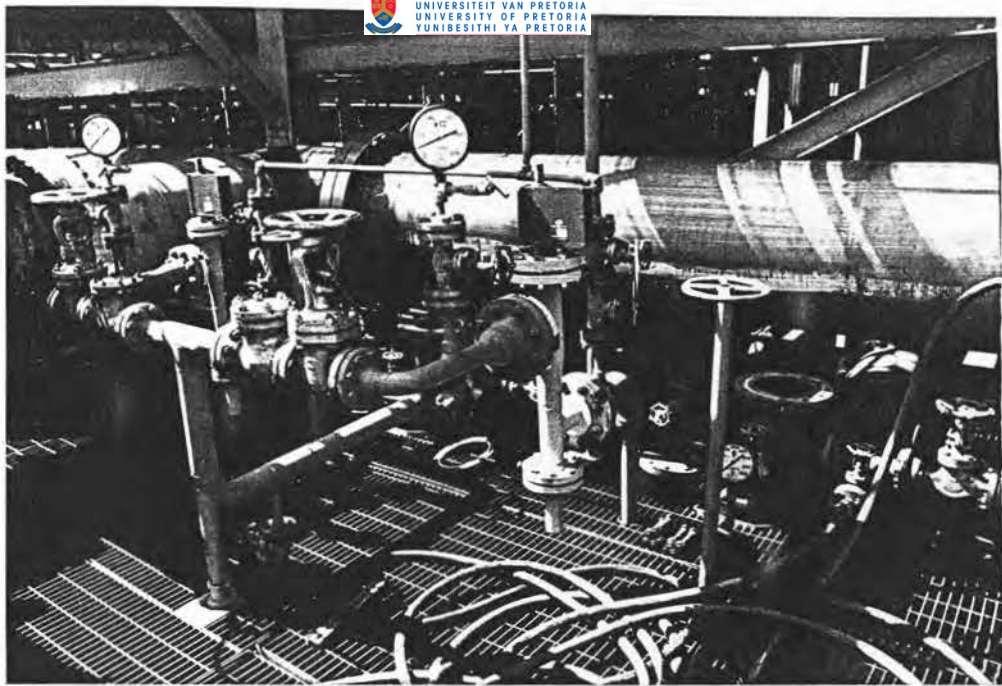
PLANT BYPASS INSTALLATION VIEWED FROM THE TOP
